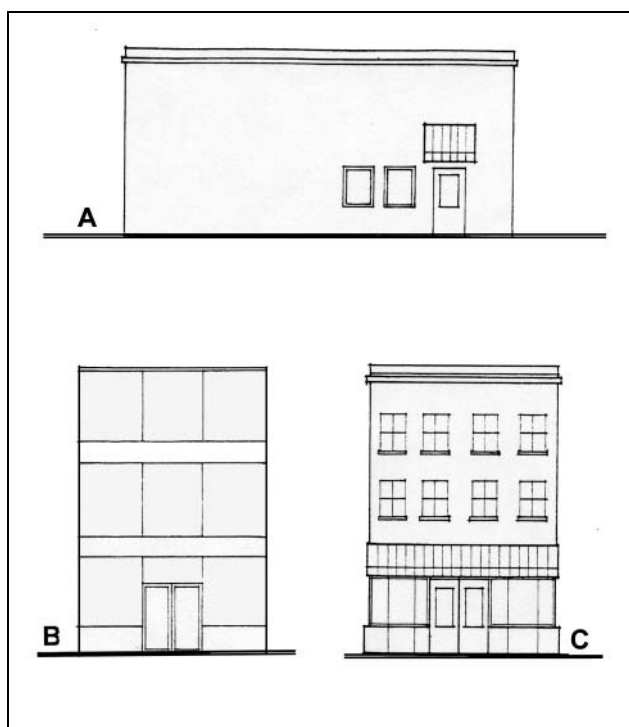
Minor changes in roof heights, materials and details can break up long building facades.
